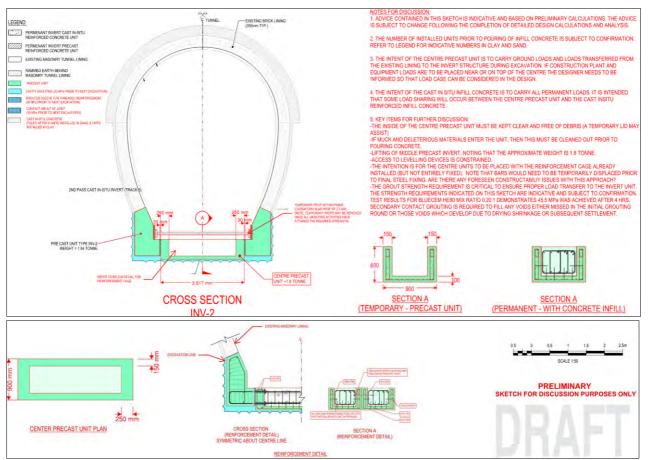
SECTION OF THE TUNNEL AND DETAILS SHOWING THE CENTRAL AND SIDE WALL PRE-CAST UNITS AS SUPPORT TYPE INV-2 IN CLAY AND SAND AREAS OF THE TUNNEL. (SOURCE: AURECON/VLINE)
